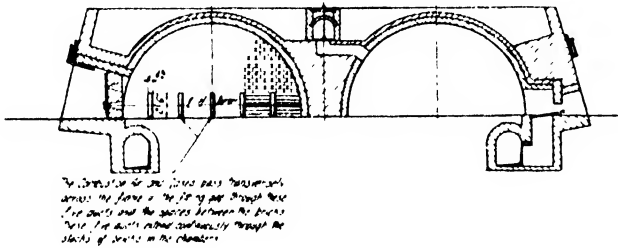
Sectional elevation through firing hole and hot-air duct.
